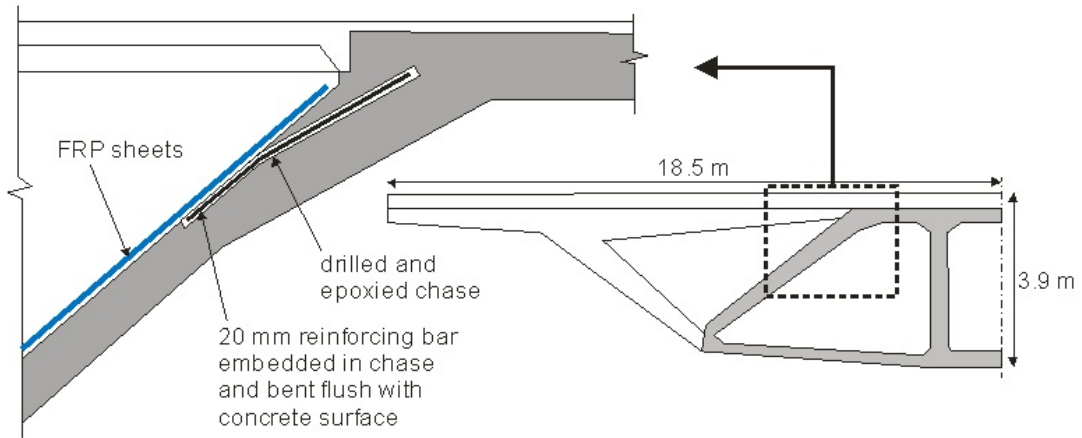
FRP anchorage used in West Gate Bridge (adapted from Williams et al., 2011).
